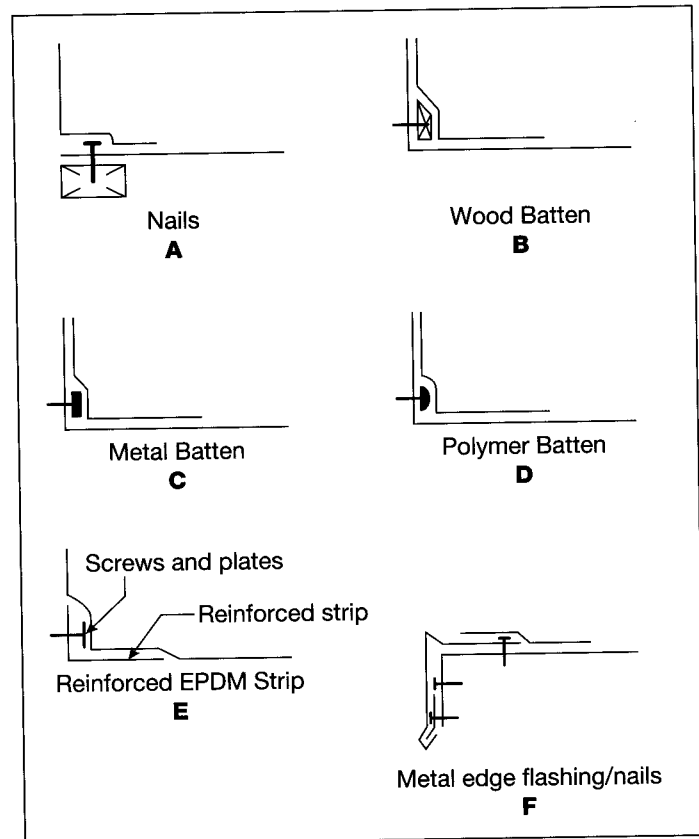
Common base securement details that have been or are still being used. (Typically, fastening strips may be installed on the vertical or horizontal plane.)
